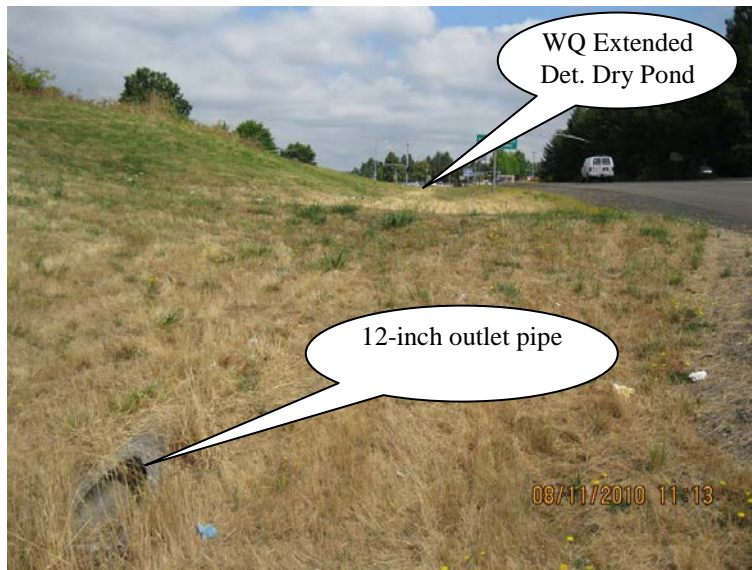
12-inch outlet pipe discharging from control structure, Point B. Photo is looking to the north.
